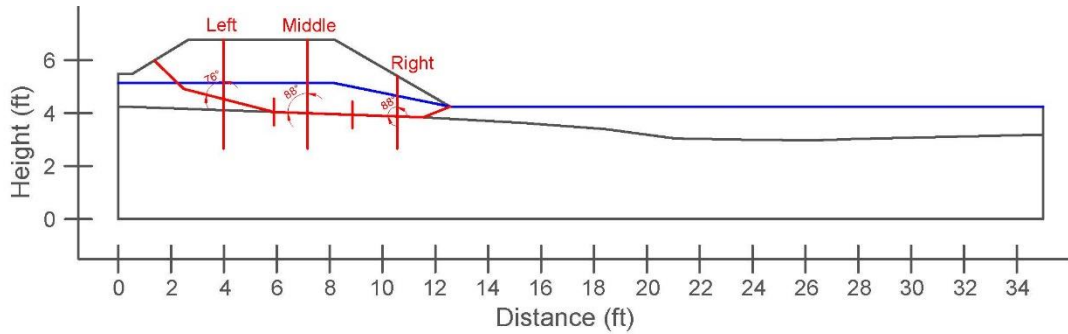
Sub-sectioning of the cross-section and failure plane for Koda Numa Railway Embankment
